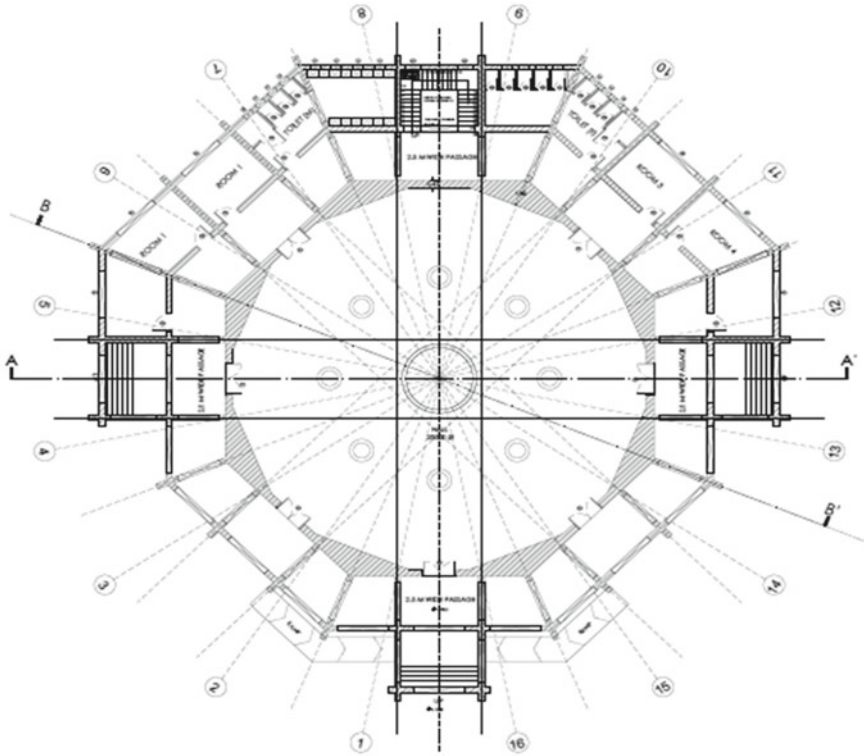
Plan of masonry dome. (Courtesy: Nandadeep Designers and Valuers Pvt Ltd, Aurangabad)
